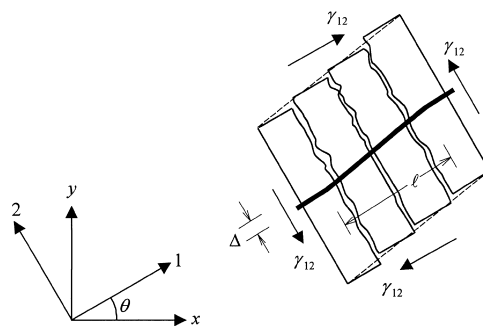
Dowel Action of a Reinforcement Bar Crossing a Crack (He and Kwan, 2001).
